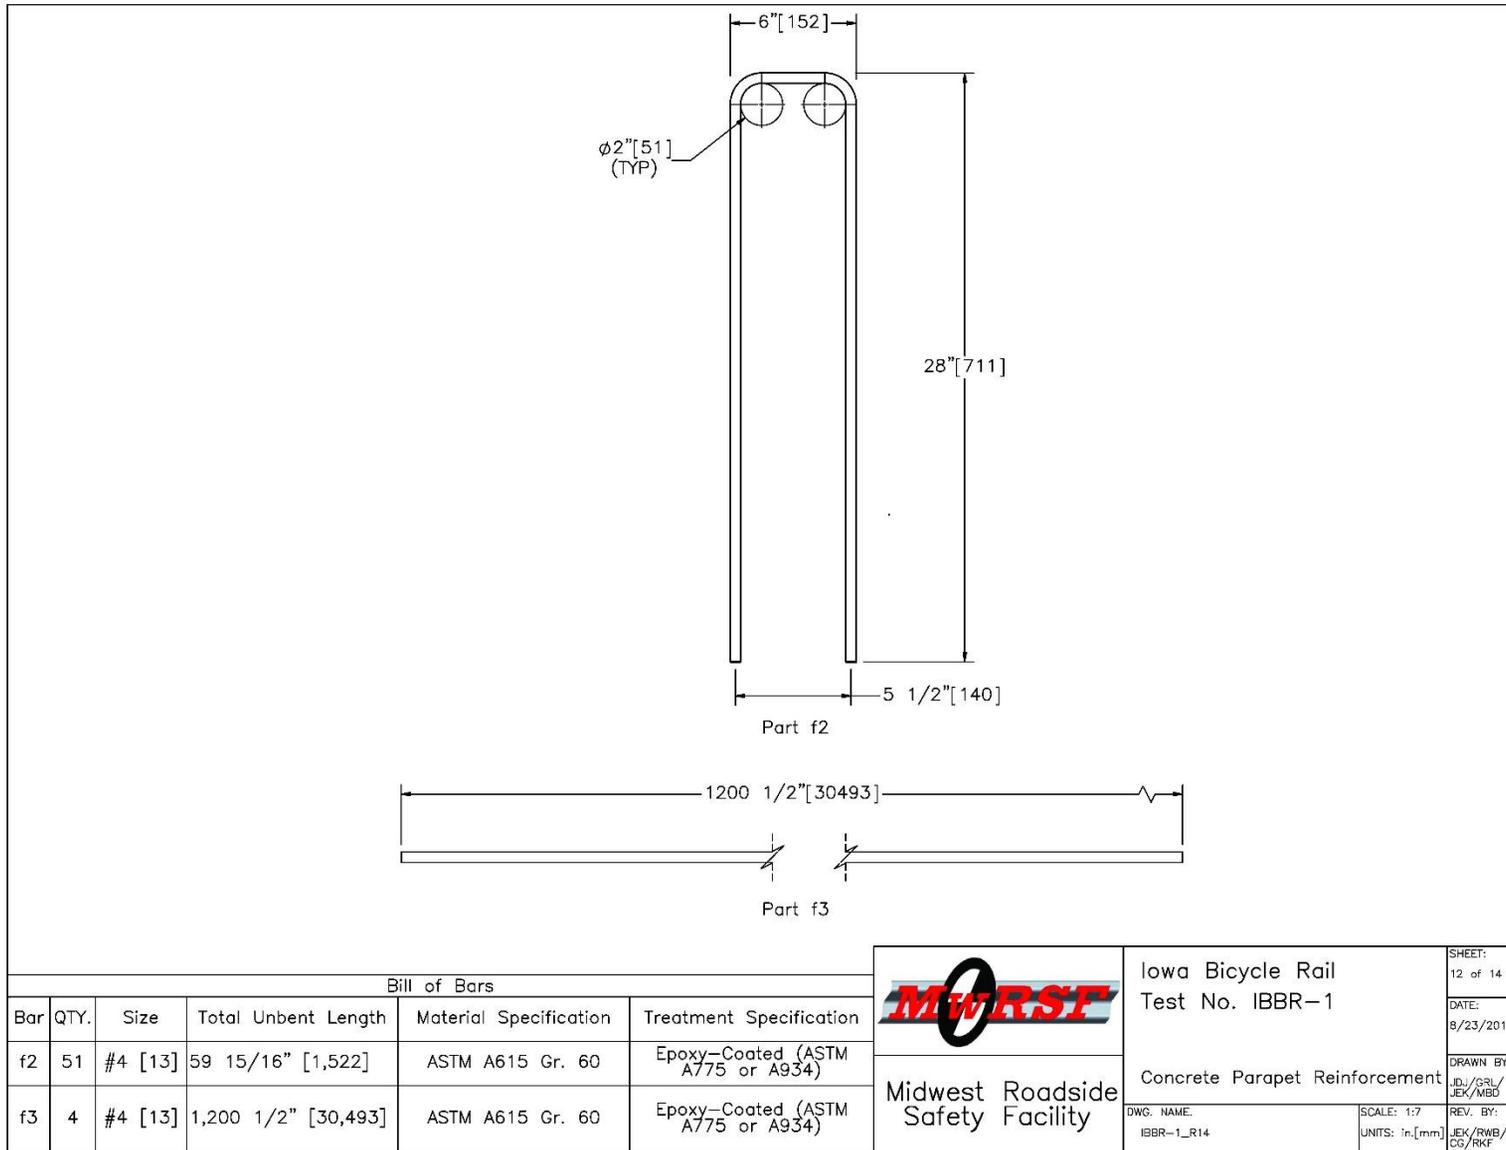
Concrete Parapet Reinforcement, Test No. IBBR-1
